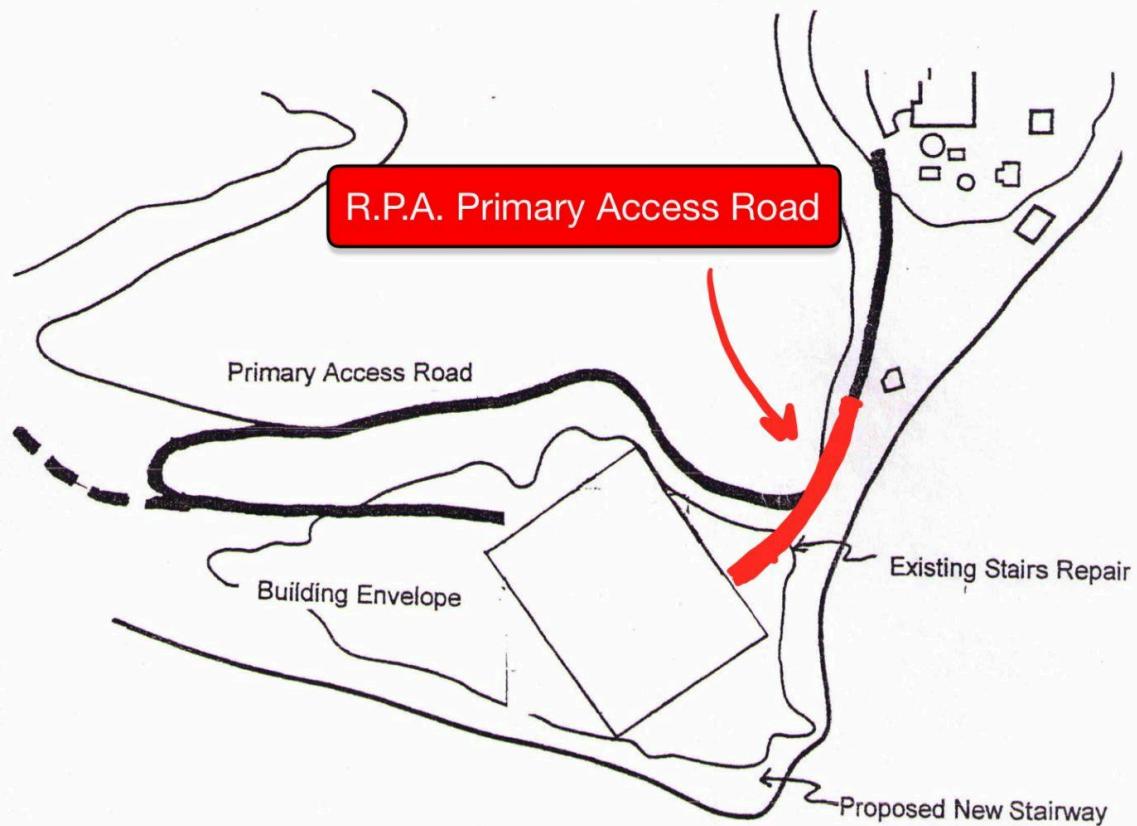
Reconfigured Project Alternative (R.P.A) Primary Access Road
